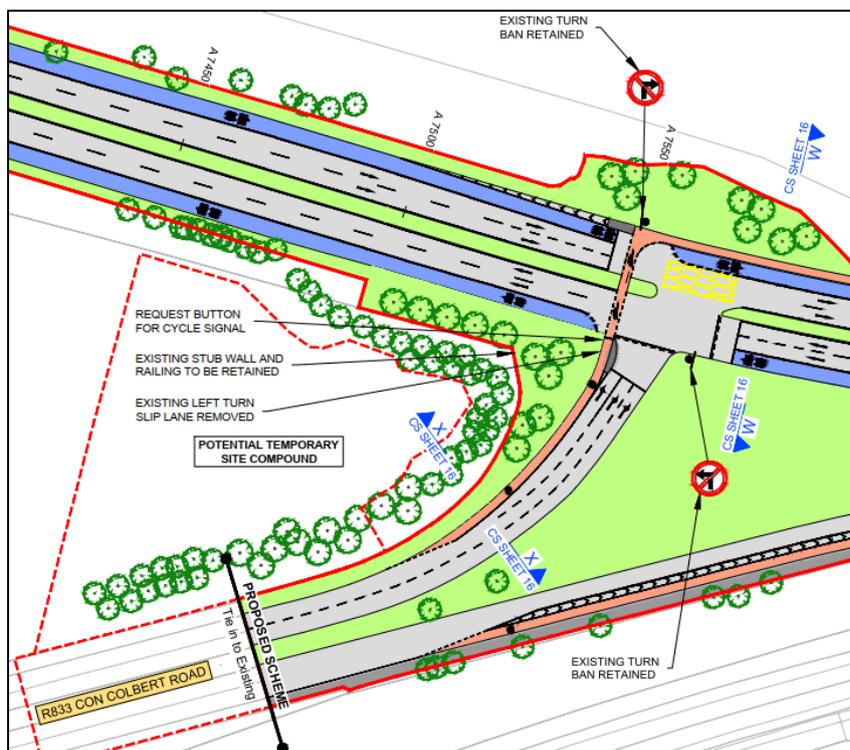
Preliminary Design of the Proposed Scheme Tie-in with the Existing Layout
